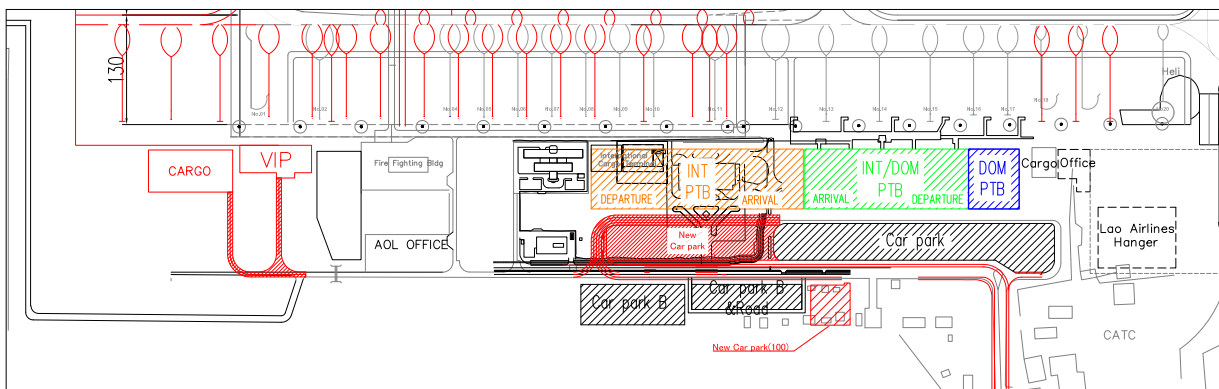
Case-1 Improvement Plan of Terminal Area
